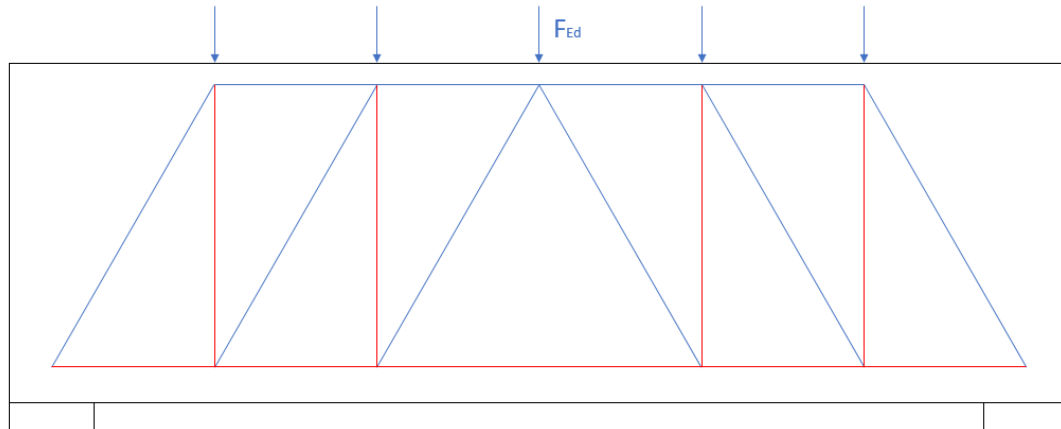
General strut and tie model for the simply supported wall girder
